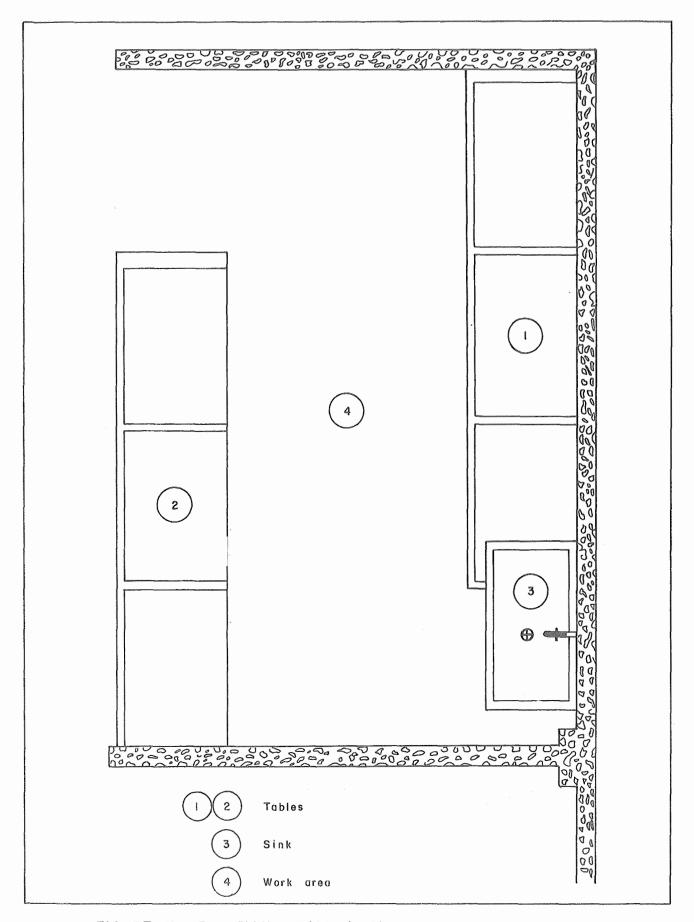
FISH STALL AREA-PROPOSED LAYOUT
